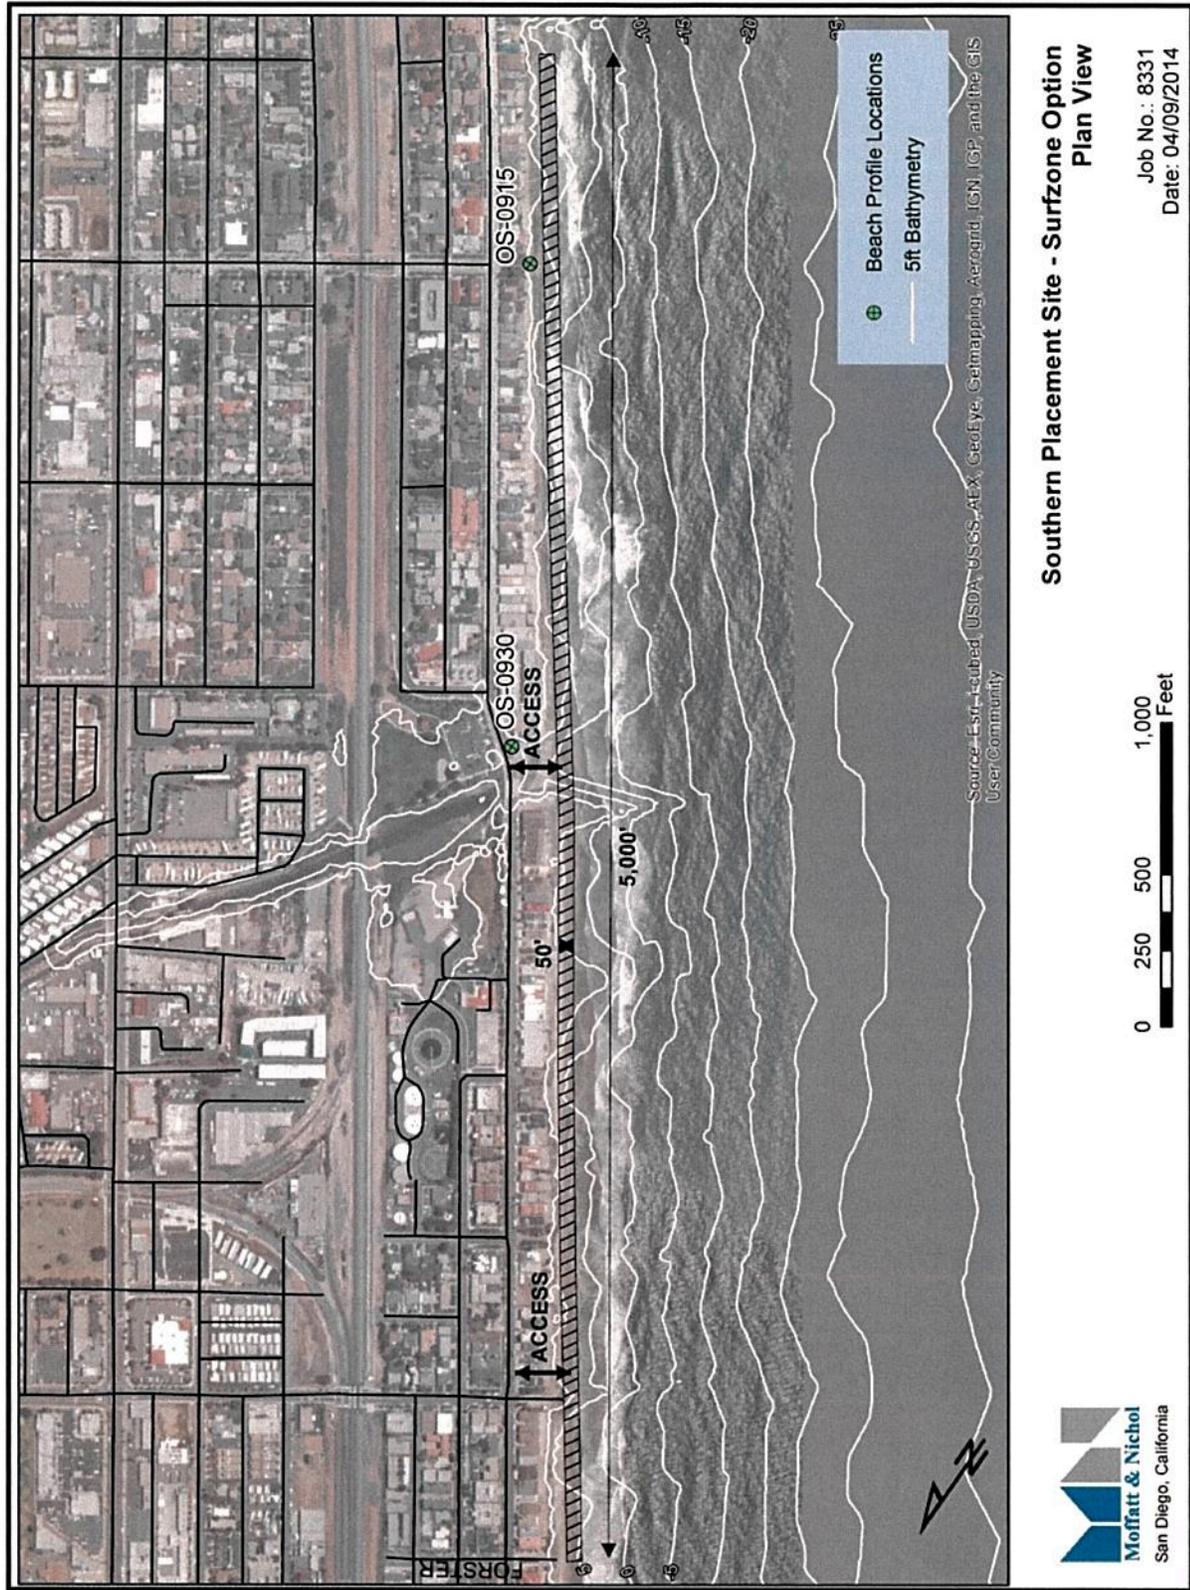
Southern Placement Site Surfzone Placement Option - Plan View
